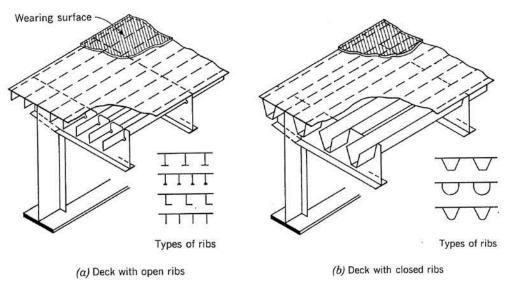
Orthotropic Steel Deck Integral with Plate Girder (taken from AISC (16)).
